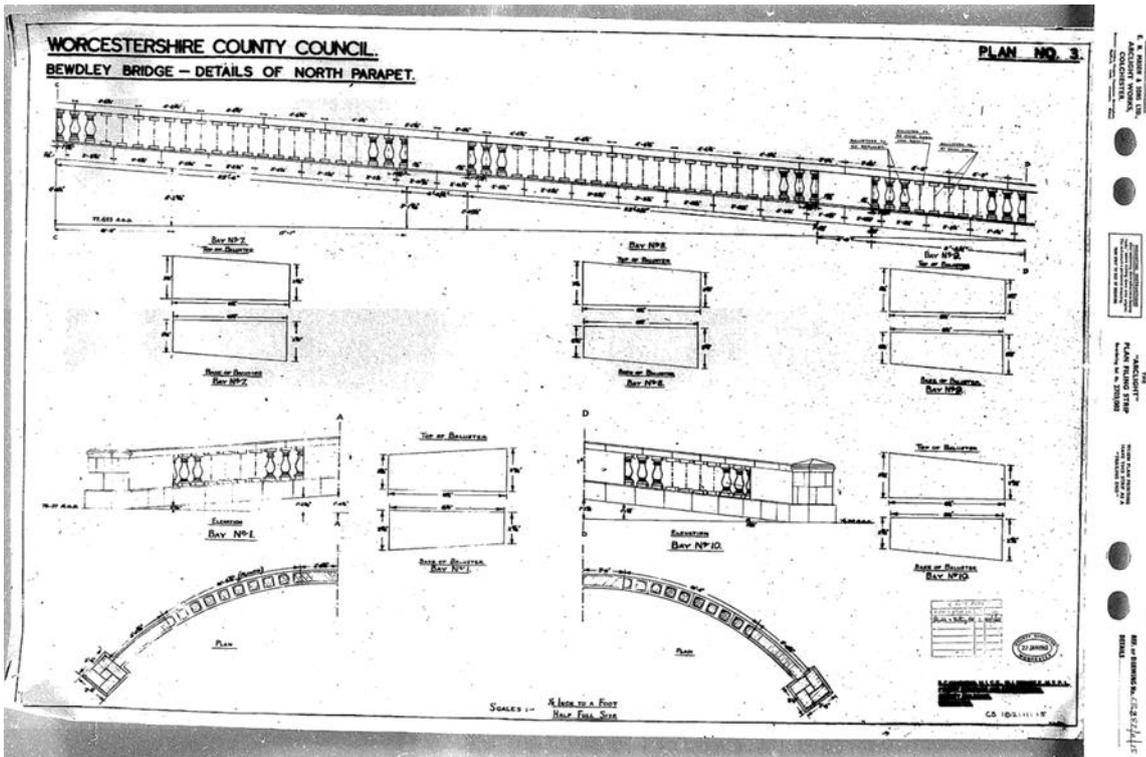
1965 plan of the north parapet, scheduling some replacement.
